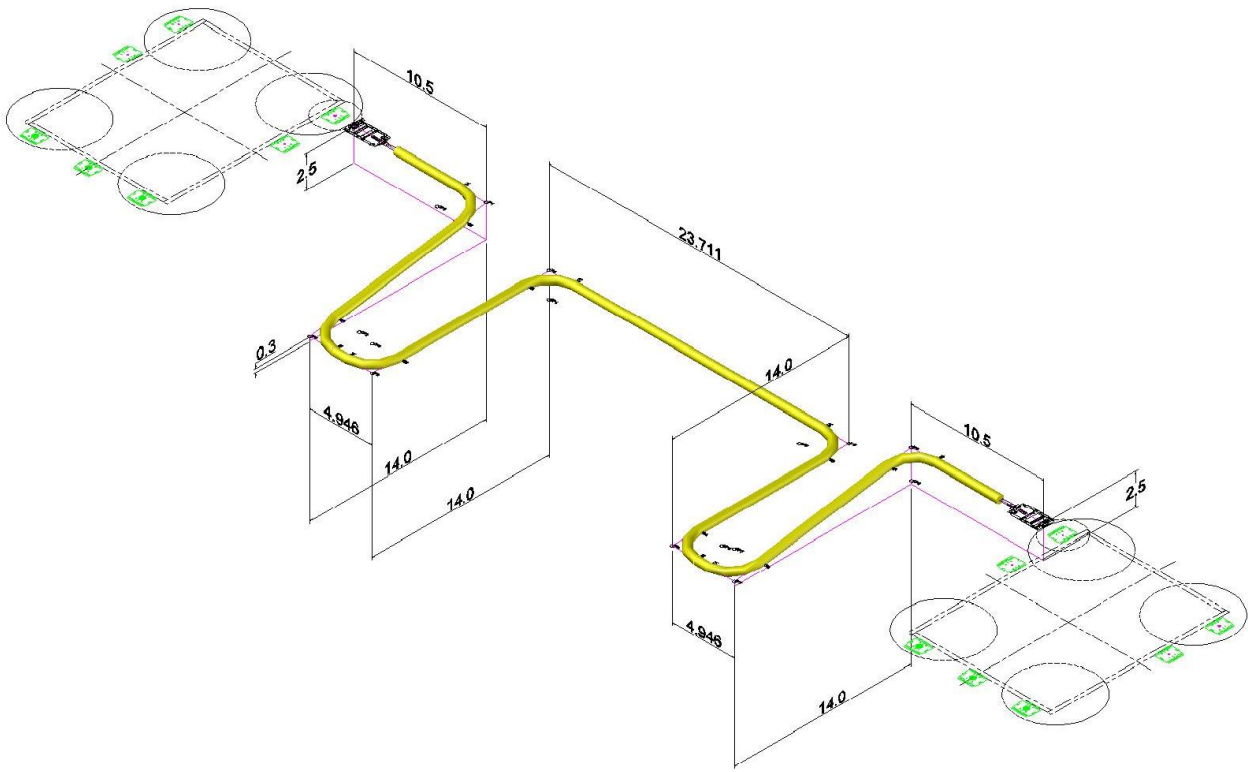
Configuration of Possible Smallest Size of Middle Spool based on Installation Tolerances
